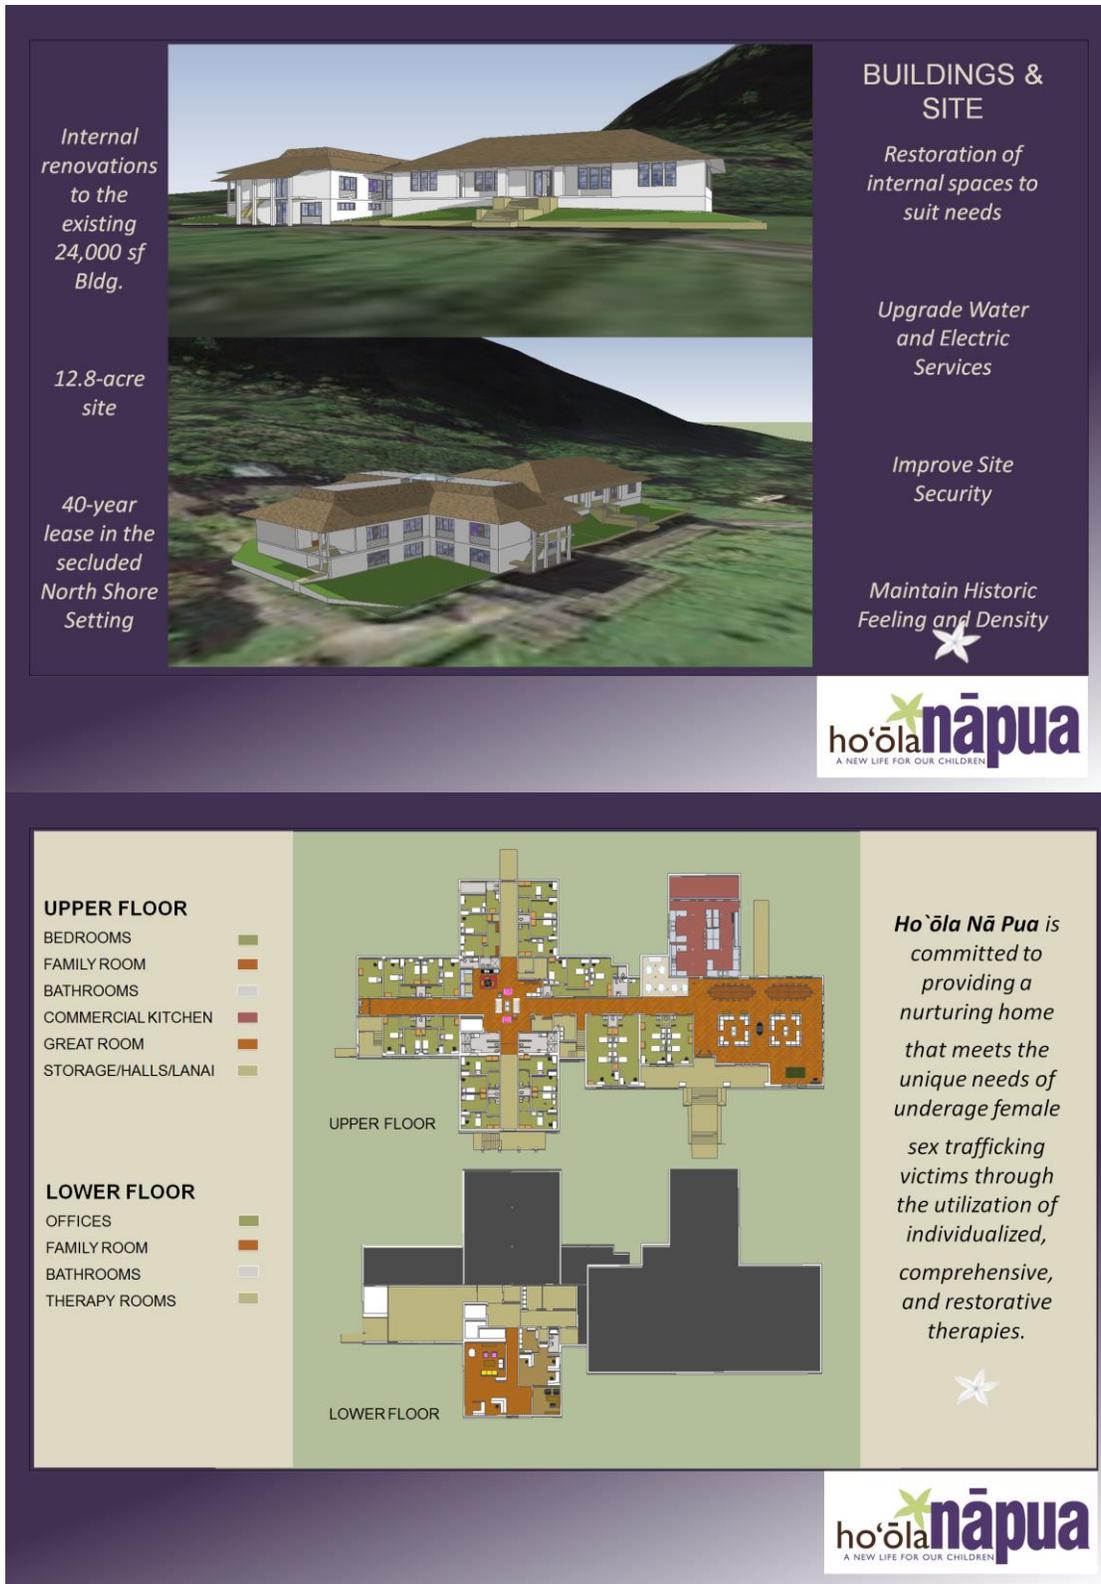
Artist's conception of the Exterior color and roof, interior layout showing upper and lower floor
